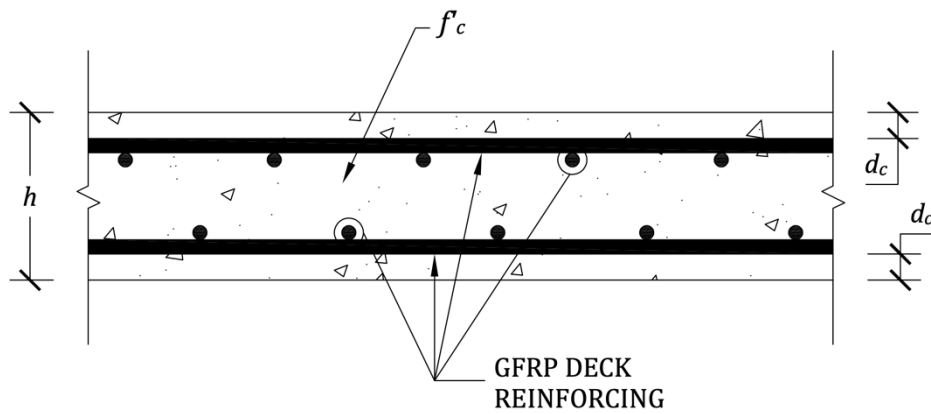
General schematic of GFRP-reinforced bridge deck variables for durable alternative deck designs.
